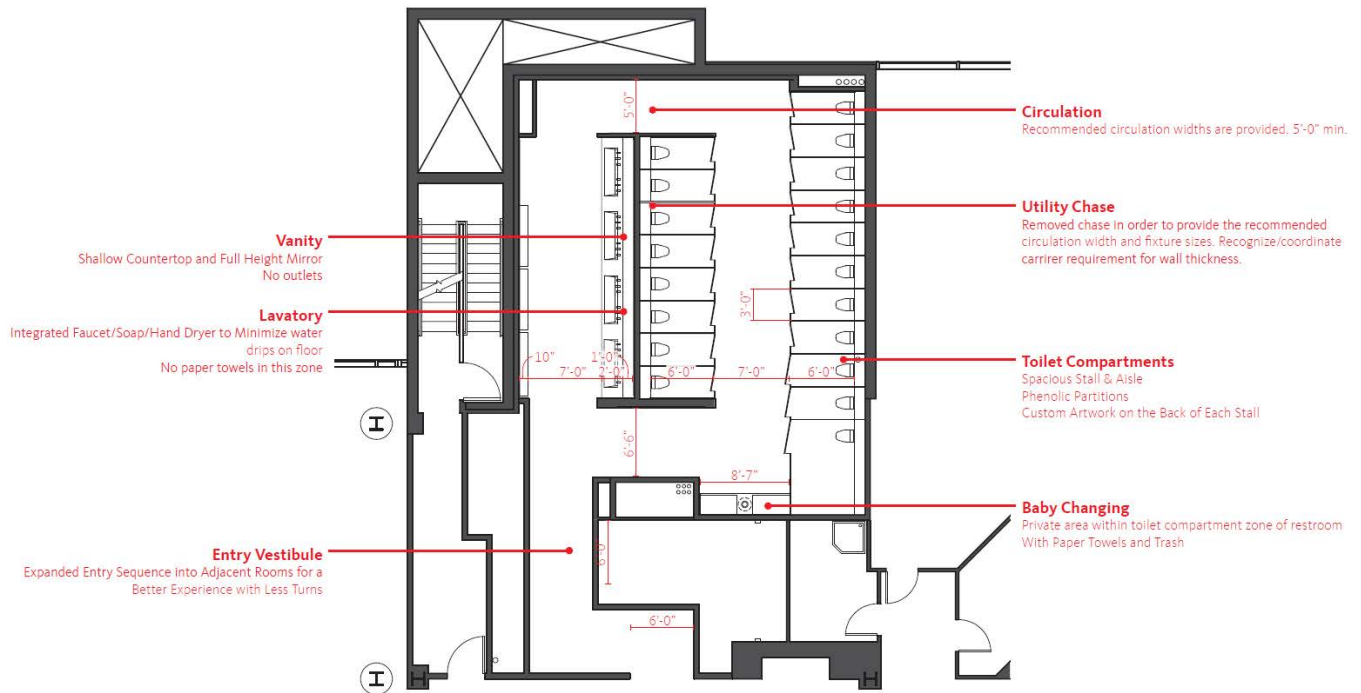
Example Proposed Restroom Remodel Plan – Concourse B, Center Core
